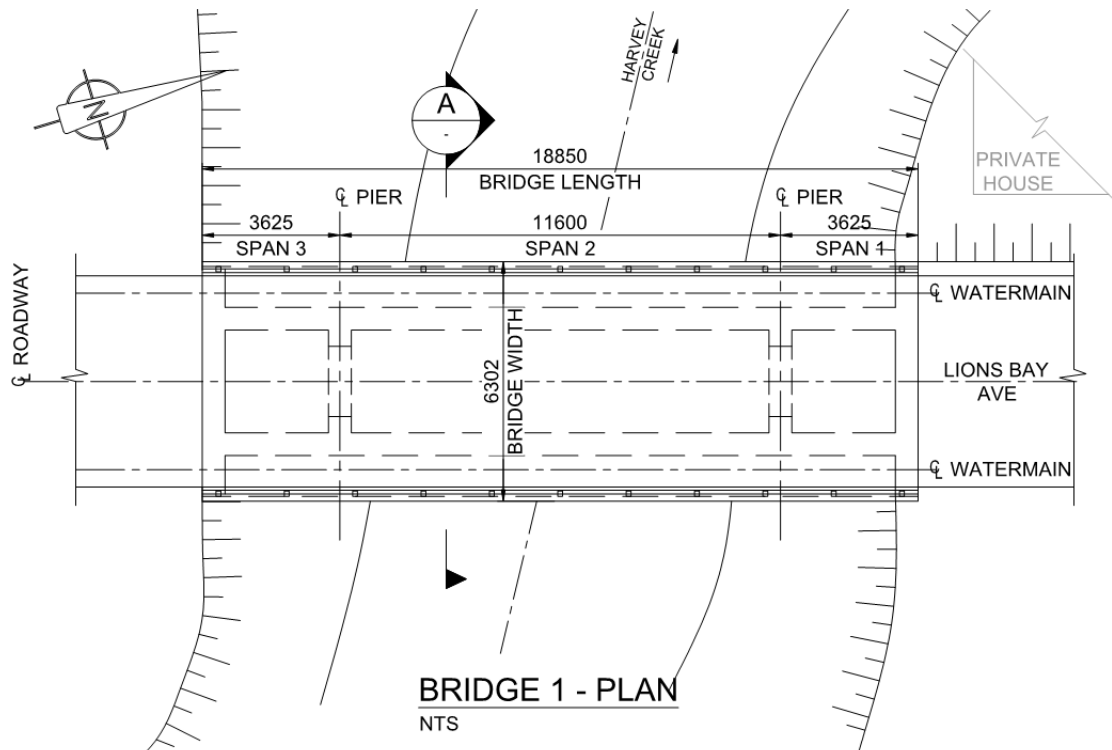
Lions Bay Avenue Bridge Over Harvey Creek – Plan
